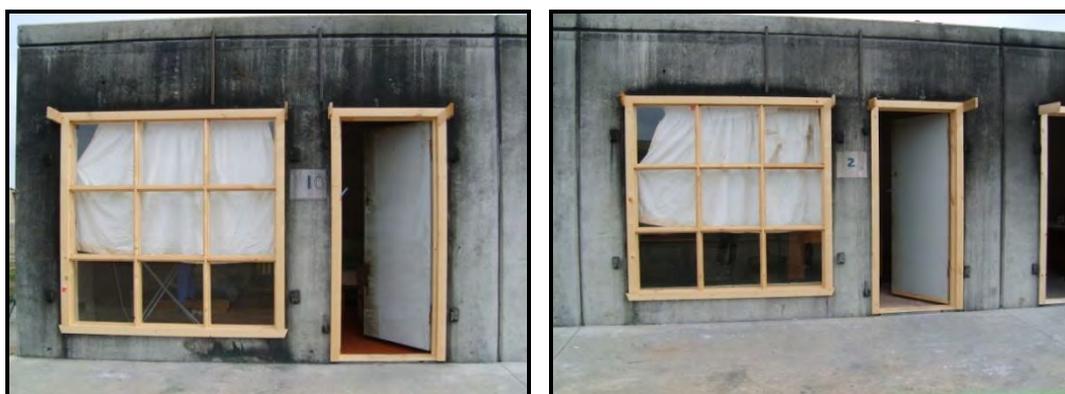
Two of the Concrete Rooms used for Large Scale Room Fires
